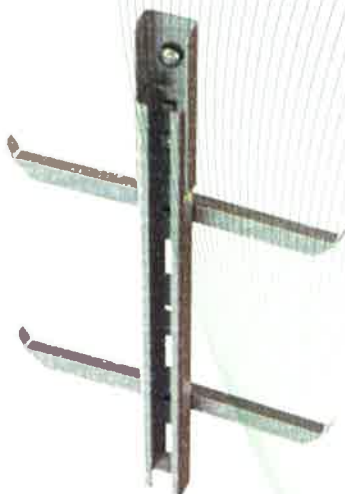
Anchor line with coupling element, type: Y-ladder (steel / stainless steel)
